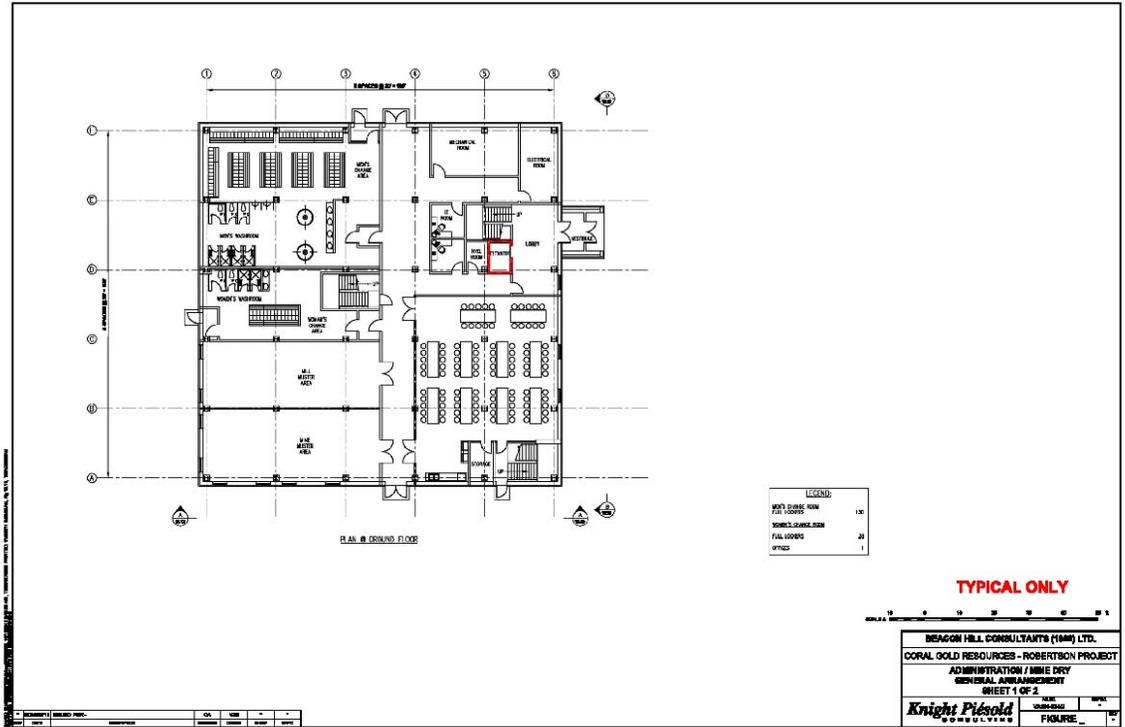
Administration / Mine Dry – General Arrangement Plan (Sheet 1 of 2)
